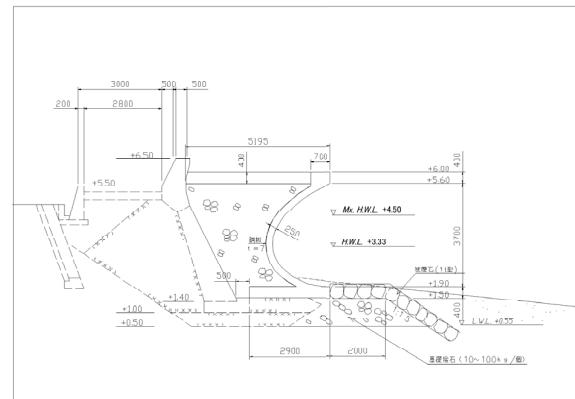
Cross section of the Flaring Shaped Seawall constructed at Kurahashi Island, Hiroshima Prefecture, Japan
